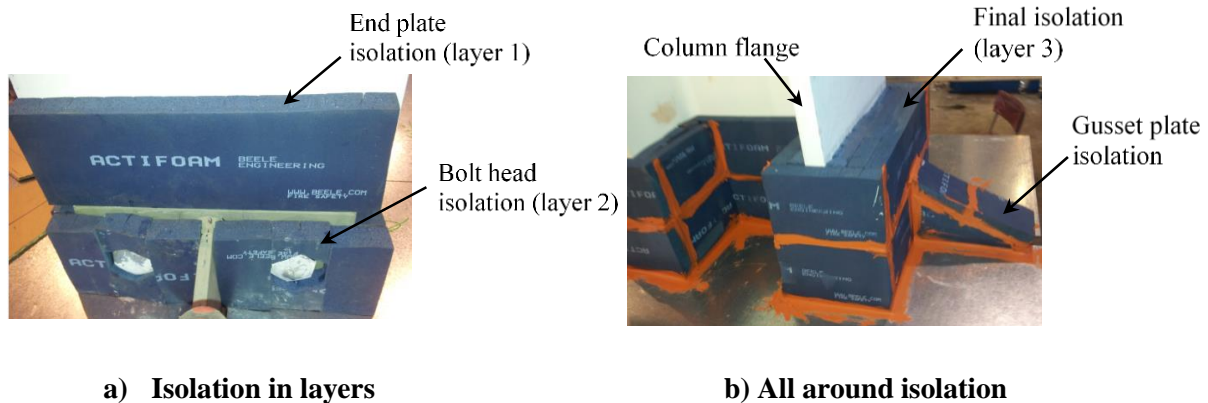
Slab Isolation details for Bolted End Plate Connection.
